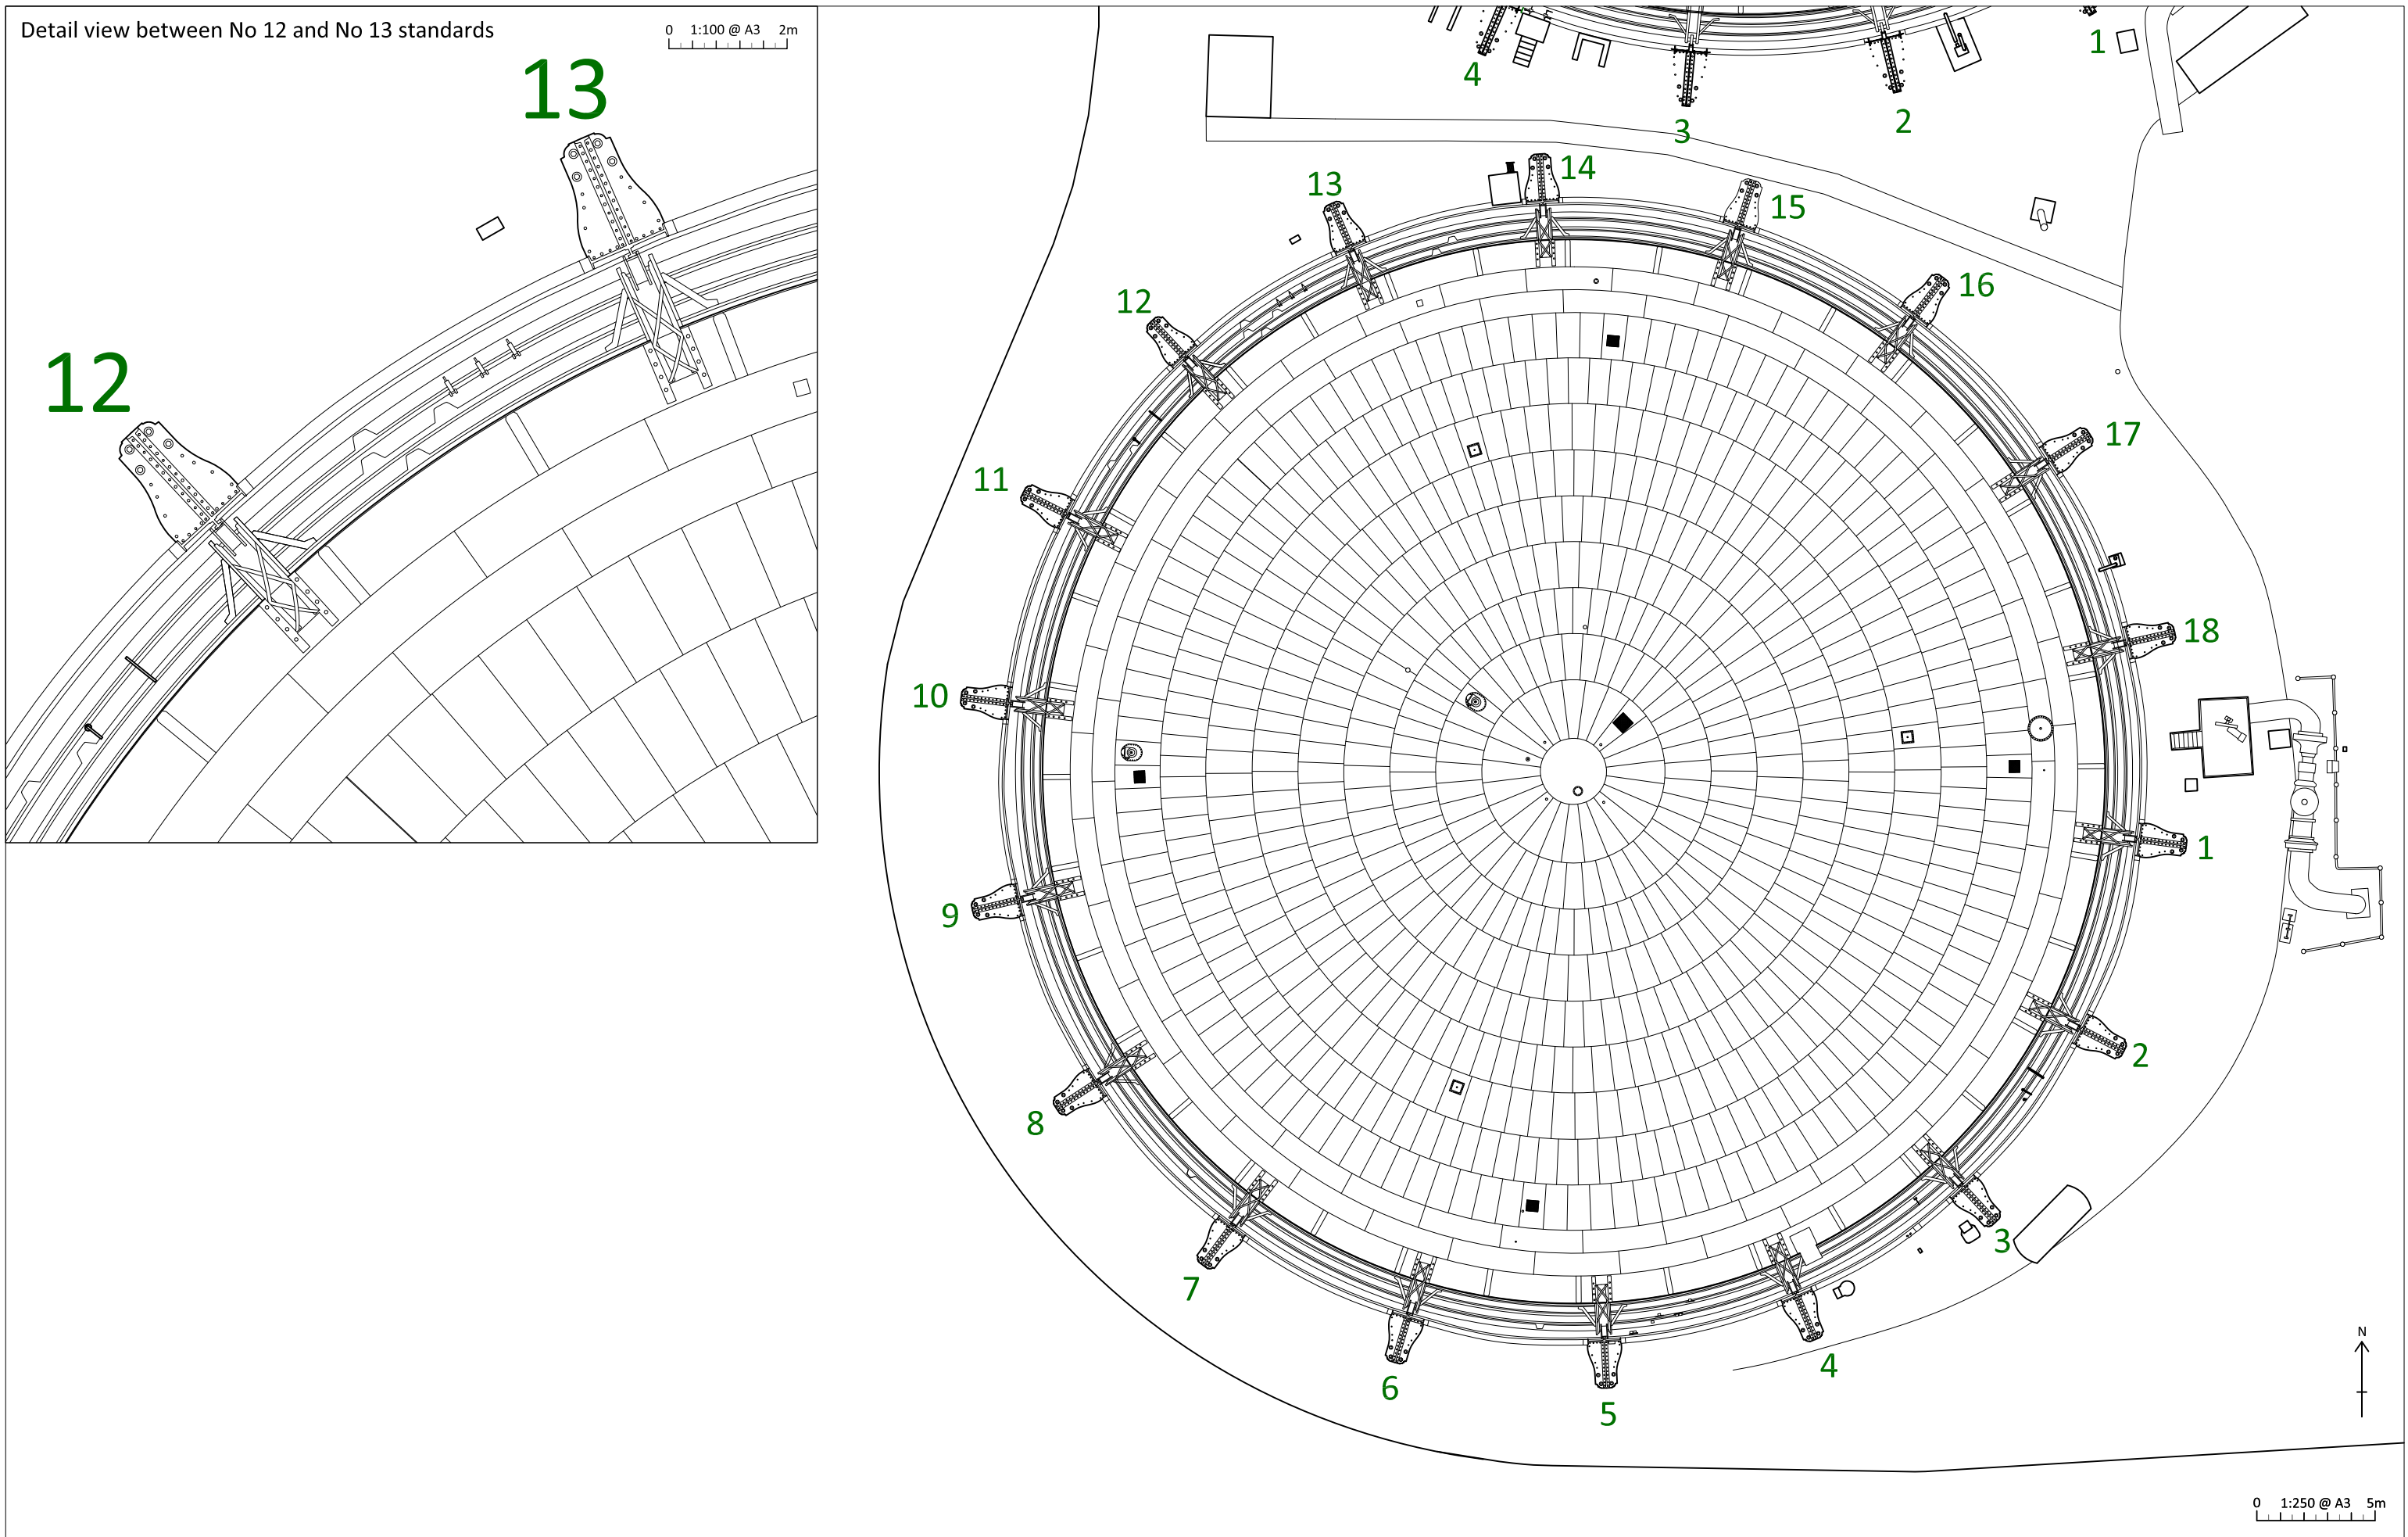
Bell Green, Sydenham, Gasholder No 7, detailed site plan
